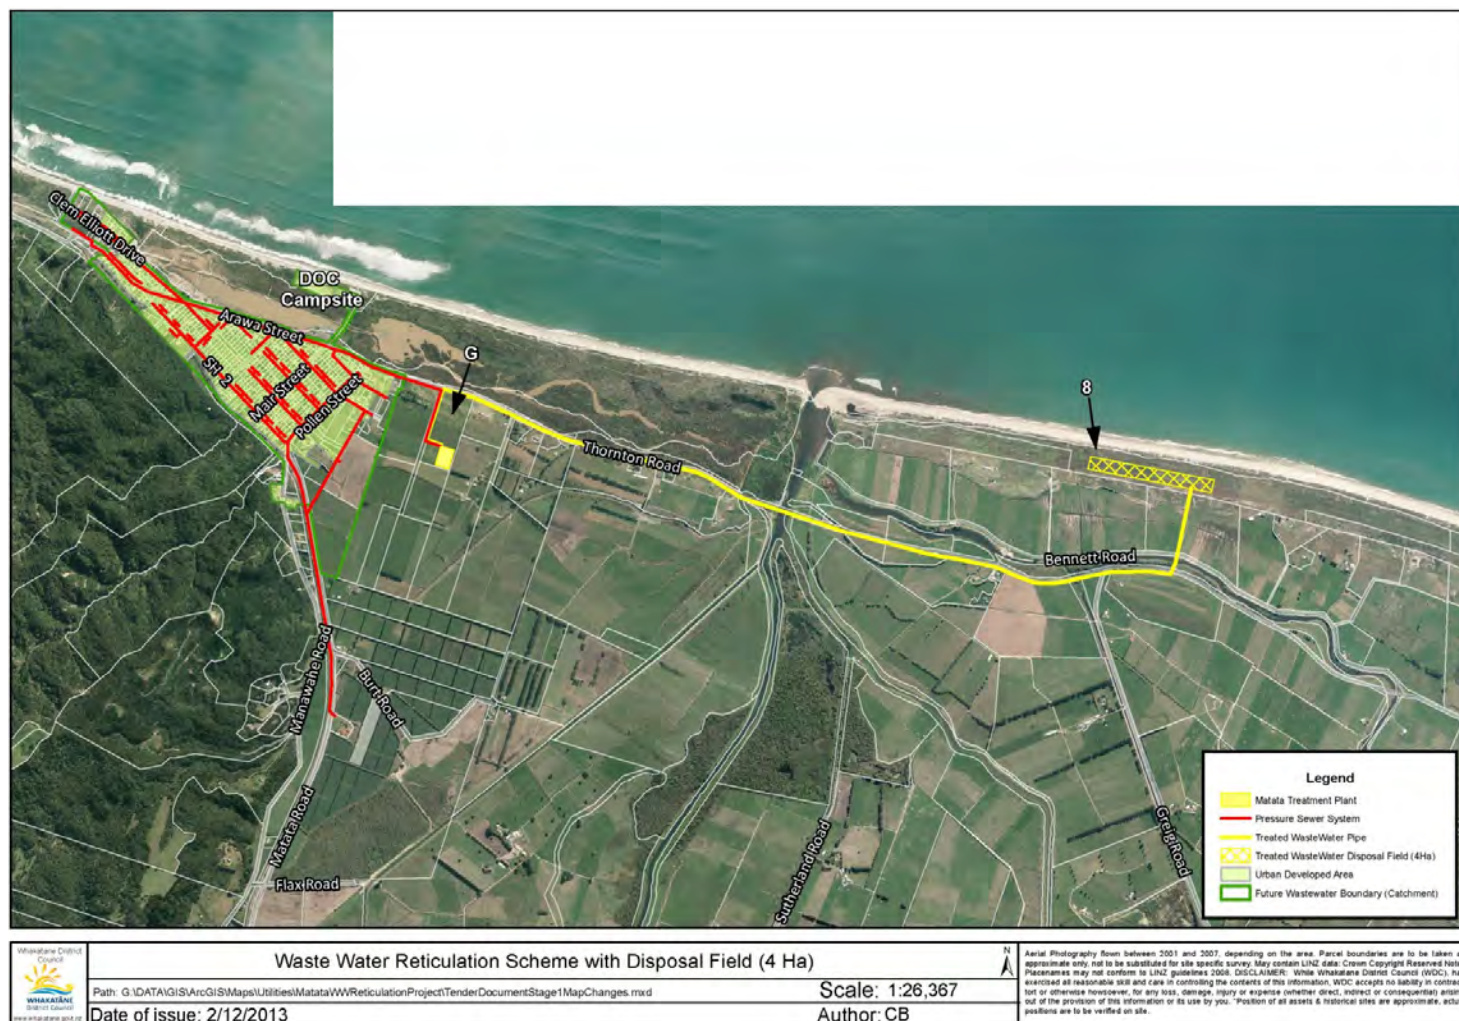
The Proposed Wastewater Scheme Concept and Layout Plan
